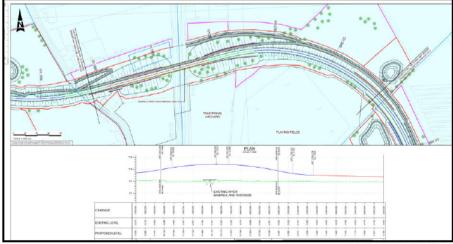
Extracted from Plan and Profile Mainline Sheet 4 of 6 ref. 22/P/1768/R3EIA
